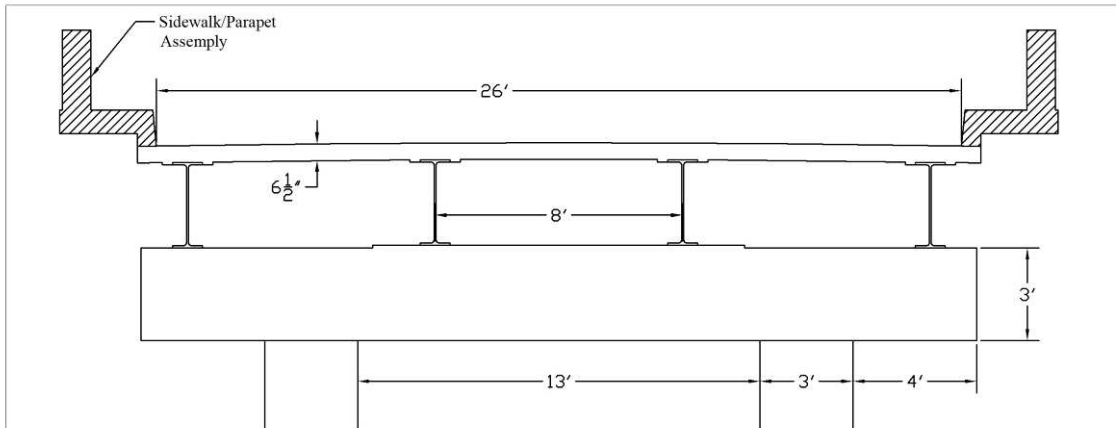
Girder and Slab Cross Section (Ref. GDOT Drawings)
